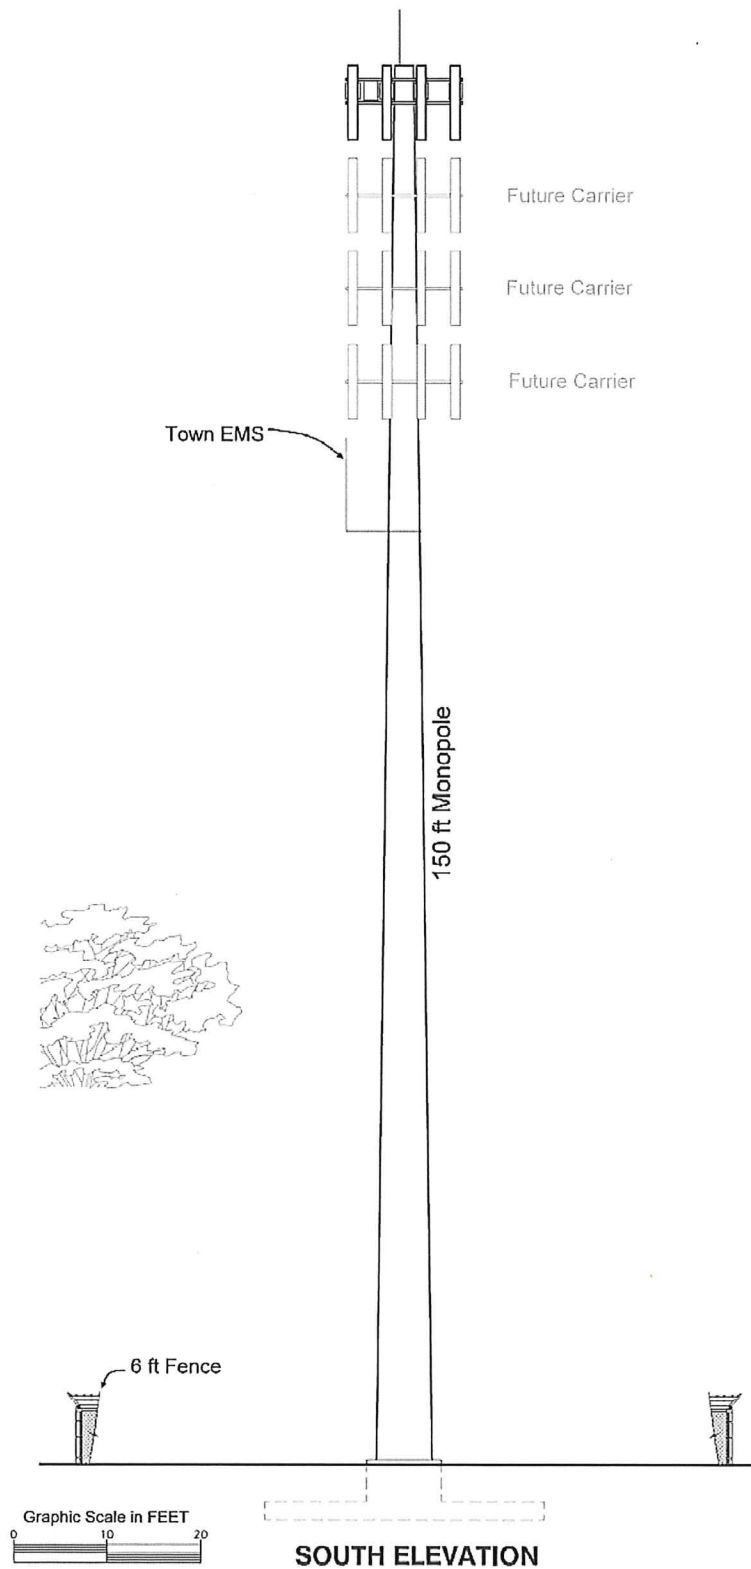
Elevation Plan Showing the Vertical Character of the Proposed Tower and Compound
